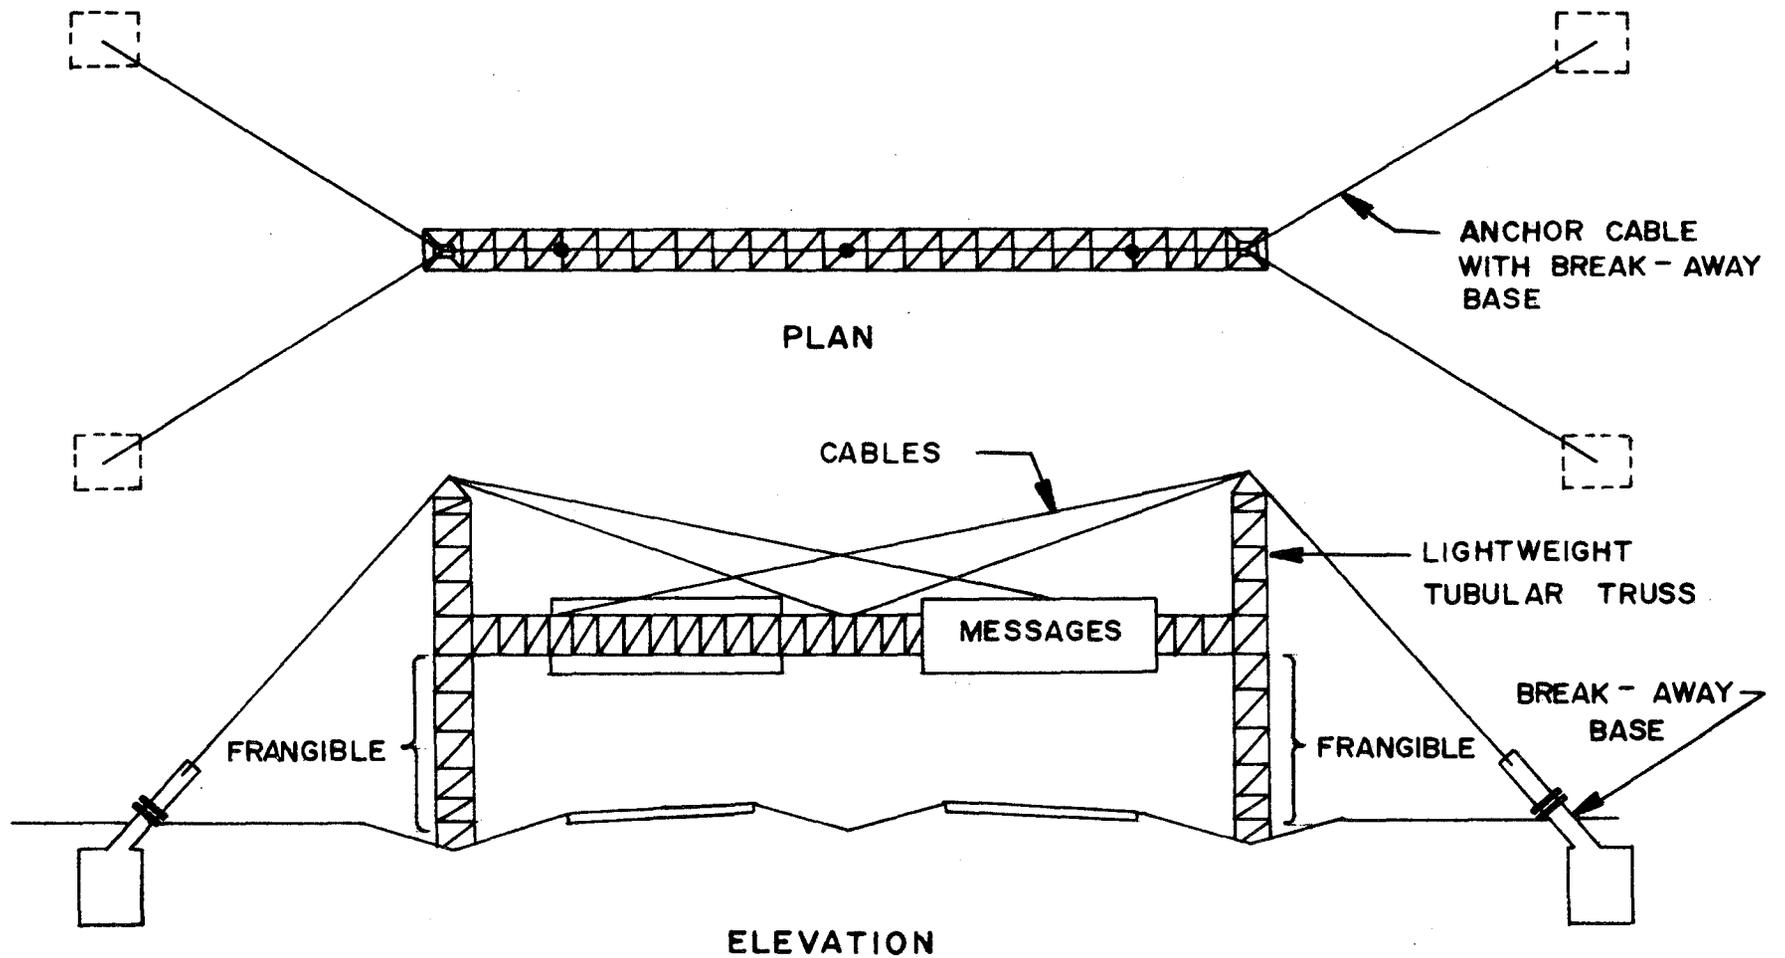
FIGURE C OVERHEAD SIGN BRIDGE WITH BREAK-AWAY BASE AND FRANGIBLE FUSE PLATE UPPER CONNECTION
